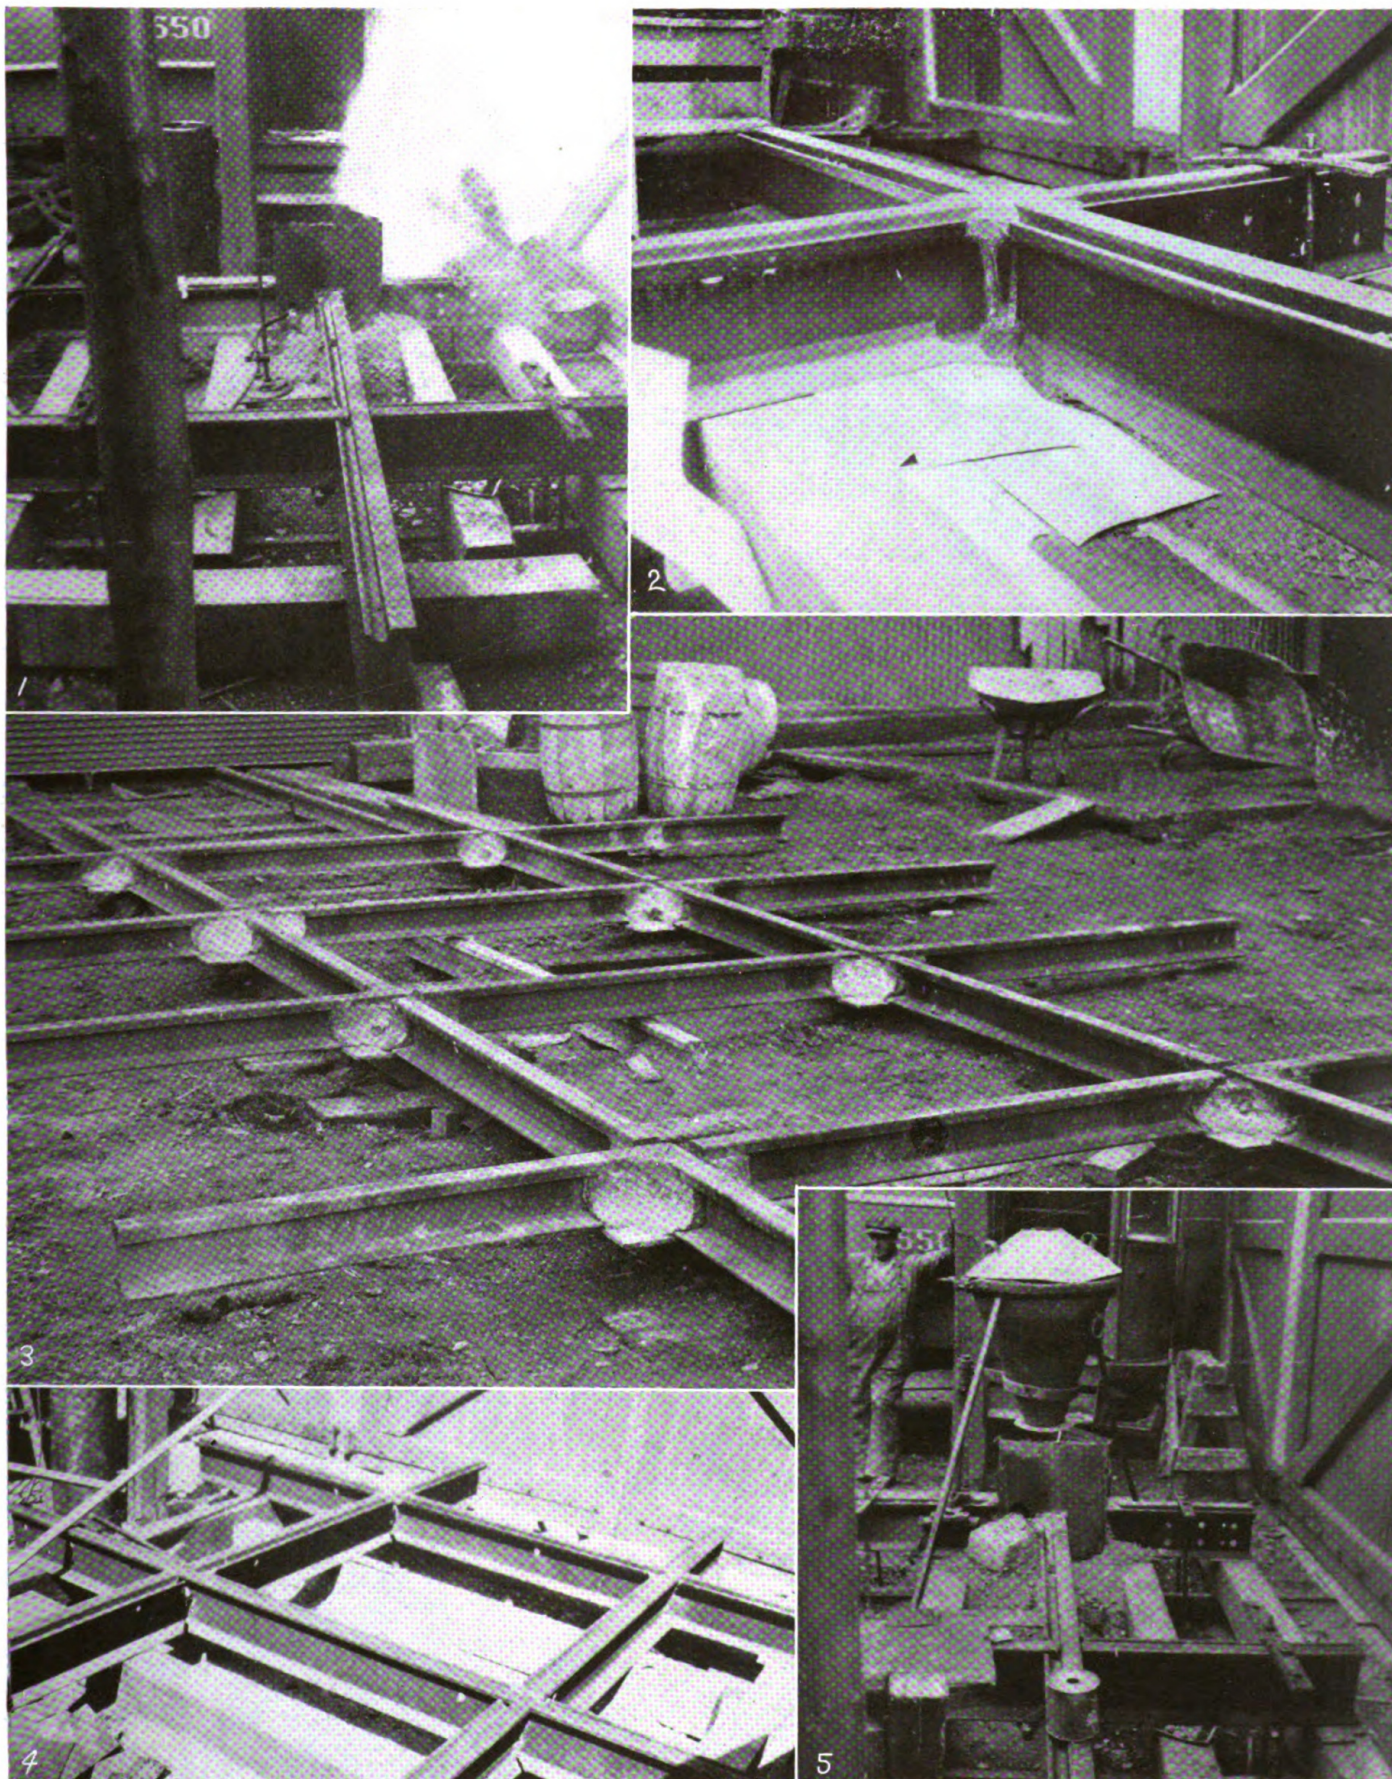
(1)—Preheating the mold. Figure 2 (2)—Yellow pattern wax applied to frog. Figure 7 (3)—Square tee rail steam and electric crossing constructed by Thermit welding. Figure 1 (4)—Rail arms lined up to form shape of crossing. Figure 4 (5)—Crucible in position ready to pour Thermit steel into mold.
